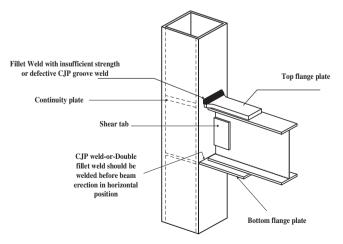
Schematic detail of WFP connection with fillet weld or with defective CJP groove weld at top flange.
